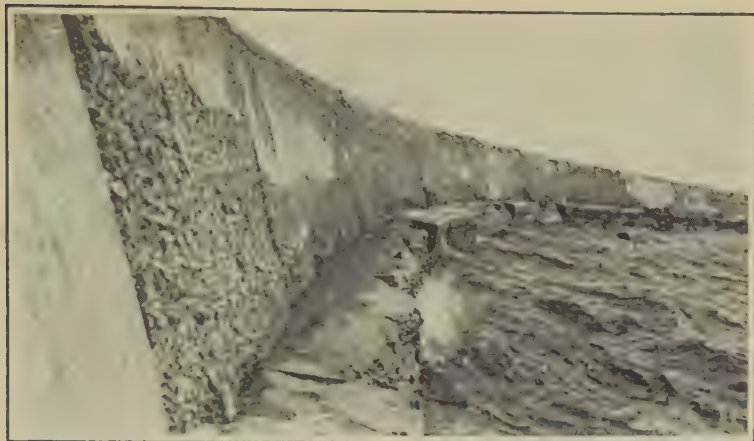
BREAKWATER BUILT IN 1906 WITH 1:3:5 CONCRETE, ILLUSTRATING THE EFFECT OF WAVES AND FROST ON POROUS CONCRETE, RESULTING FROM TOO LEAN A MIXTURE.
